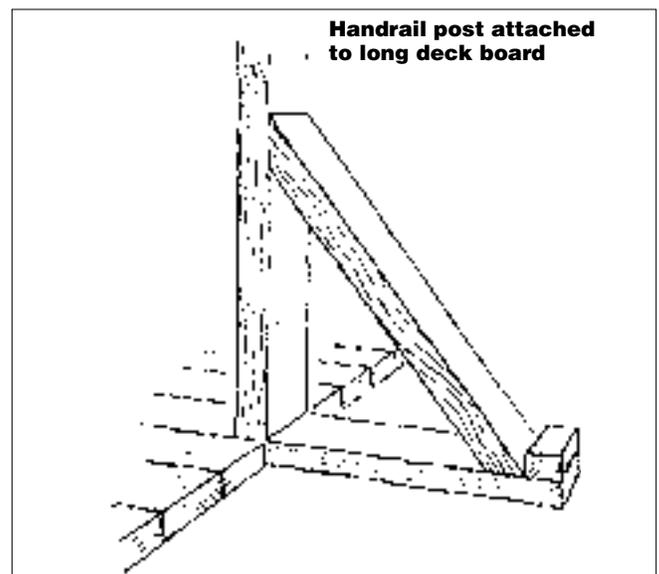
Attaching the handrail post directly to the decking requires long deck pieces to support an angle brace.
